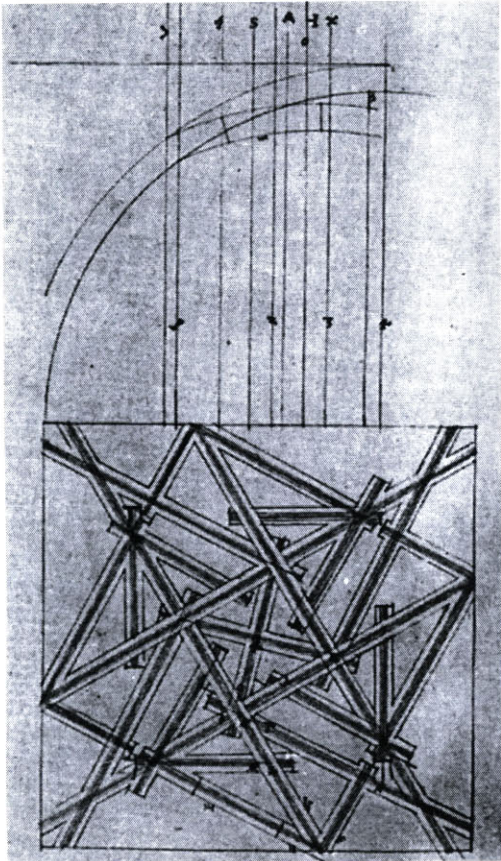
Complex vault plan, the Dresden Sketchbook.
